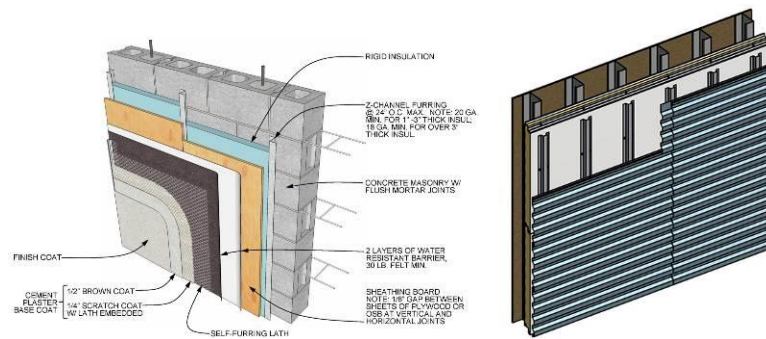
Comparison of different types of wall details: old structural system with masonry block walls on the left and new structural system with sandwich walls on the right
